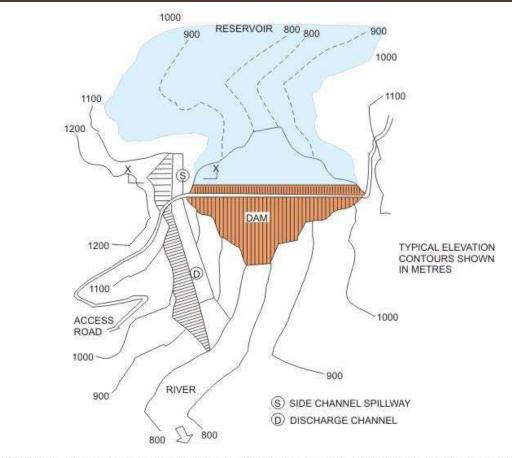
Plan of an embankment dam showing side channel spillway and chute channel
